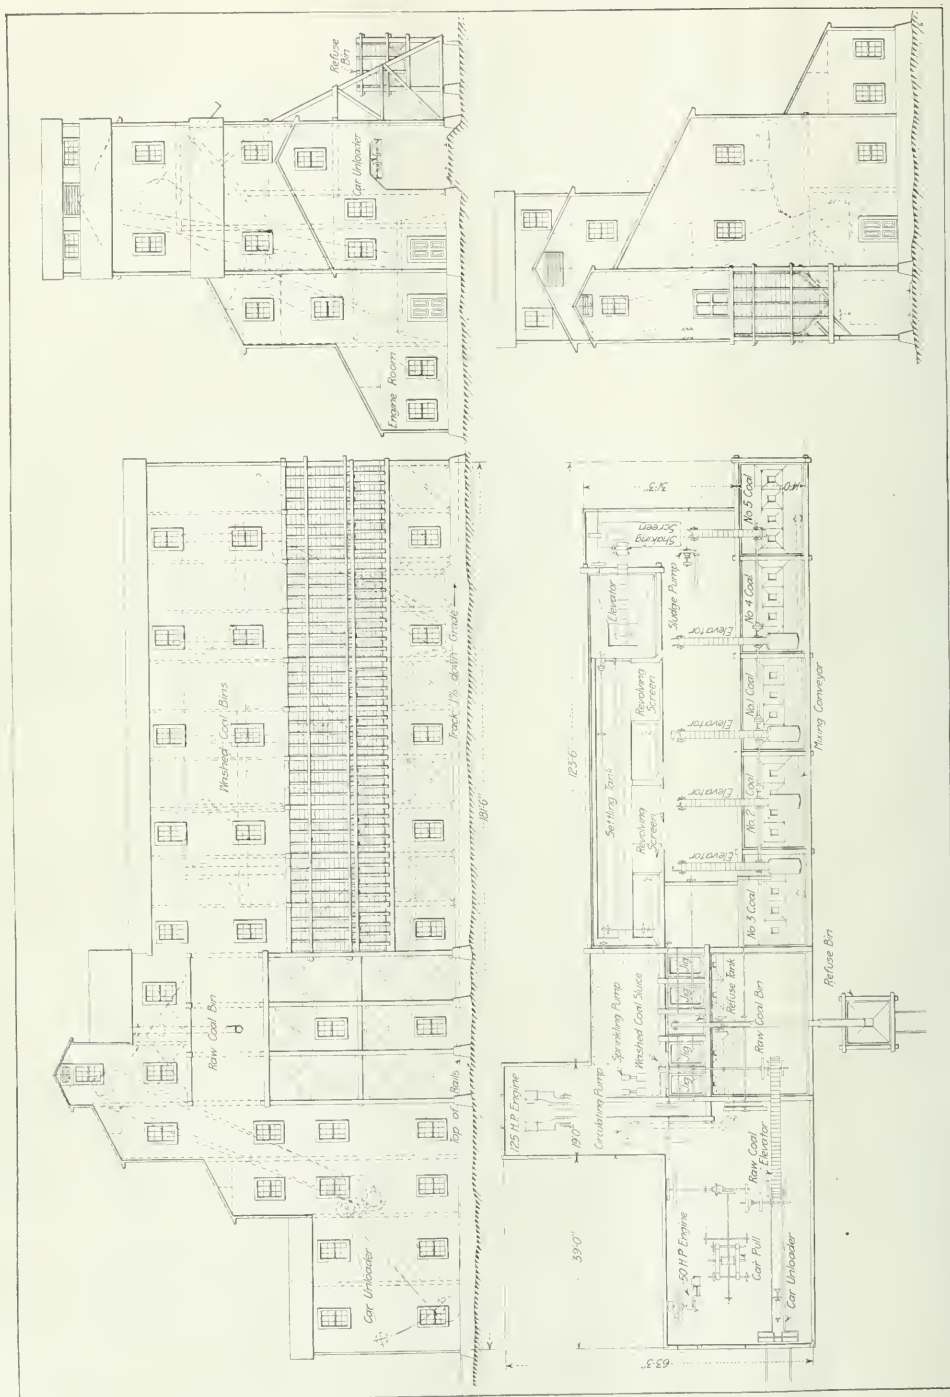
SHOWING THE GENERAL PLAN AND ELEVATION OF A COAL WASHERY
